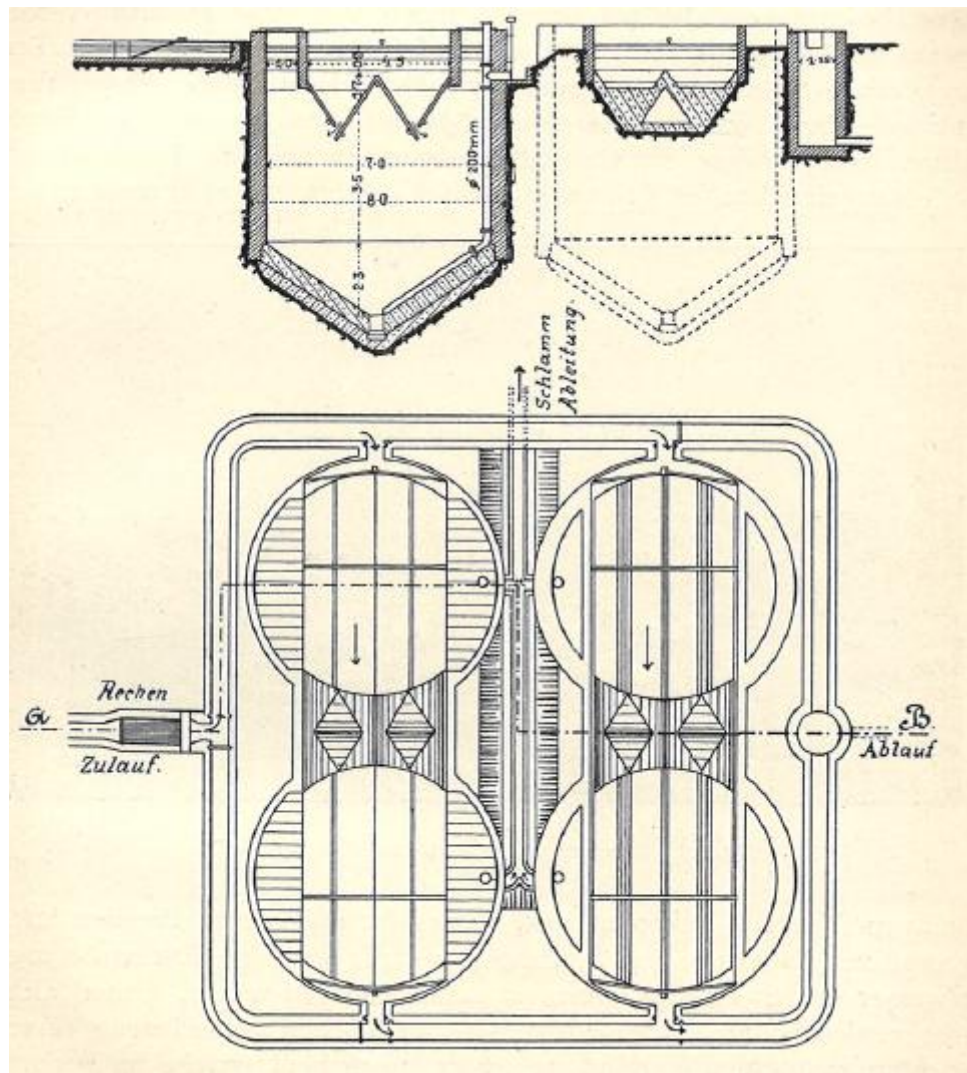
Group of for Imhoff tanks, vertical section and plan view
